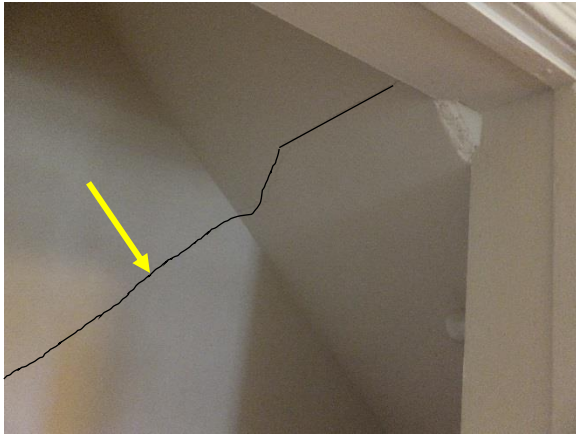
Diagonal cracking underneath stairwell. Crack traced for clarity.
